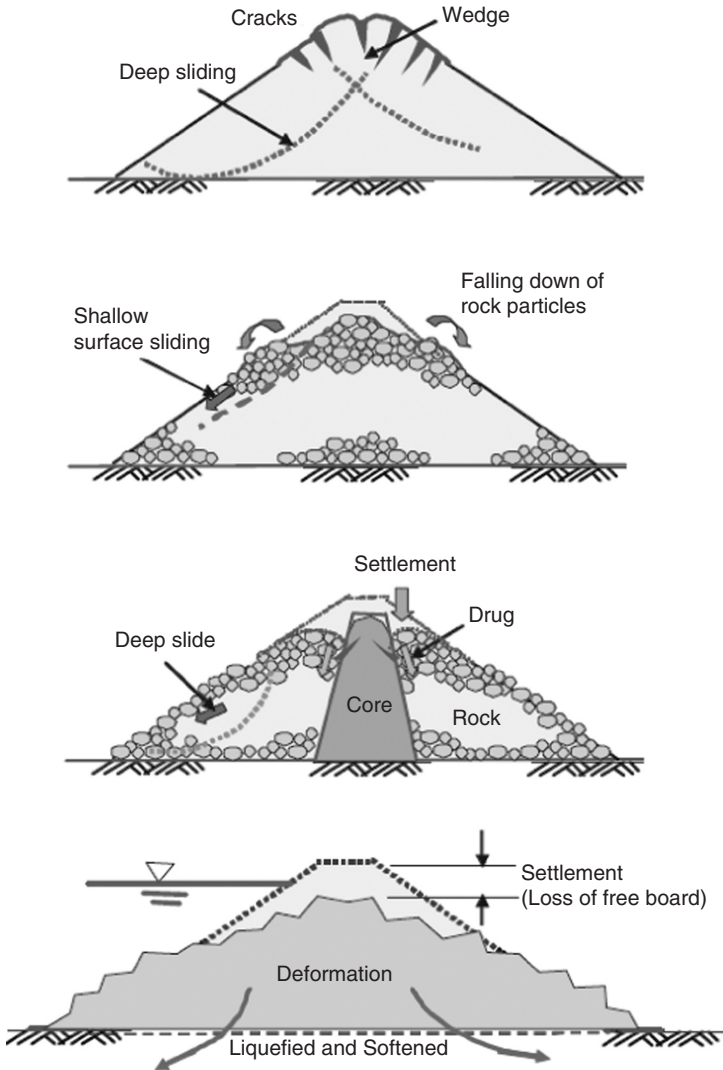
Earthquake-induced failures in embankment dams (after [5]).
